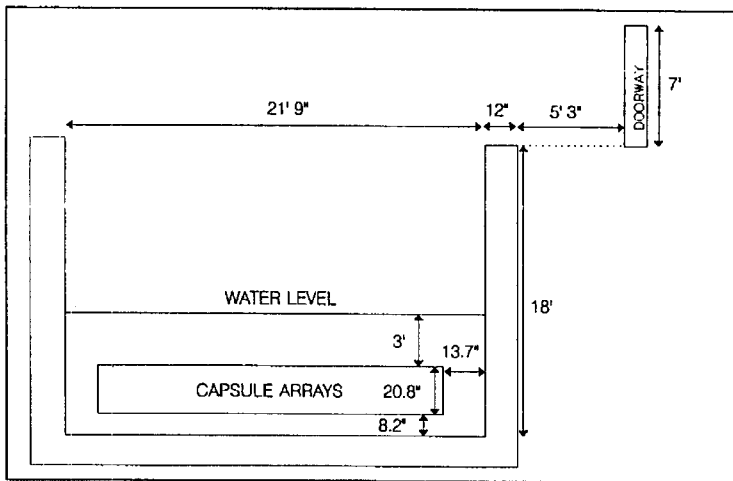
Elevation View of WESF Pool 7 and Airlock Doorway
